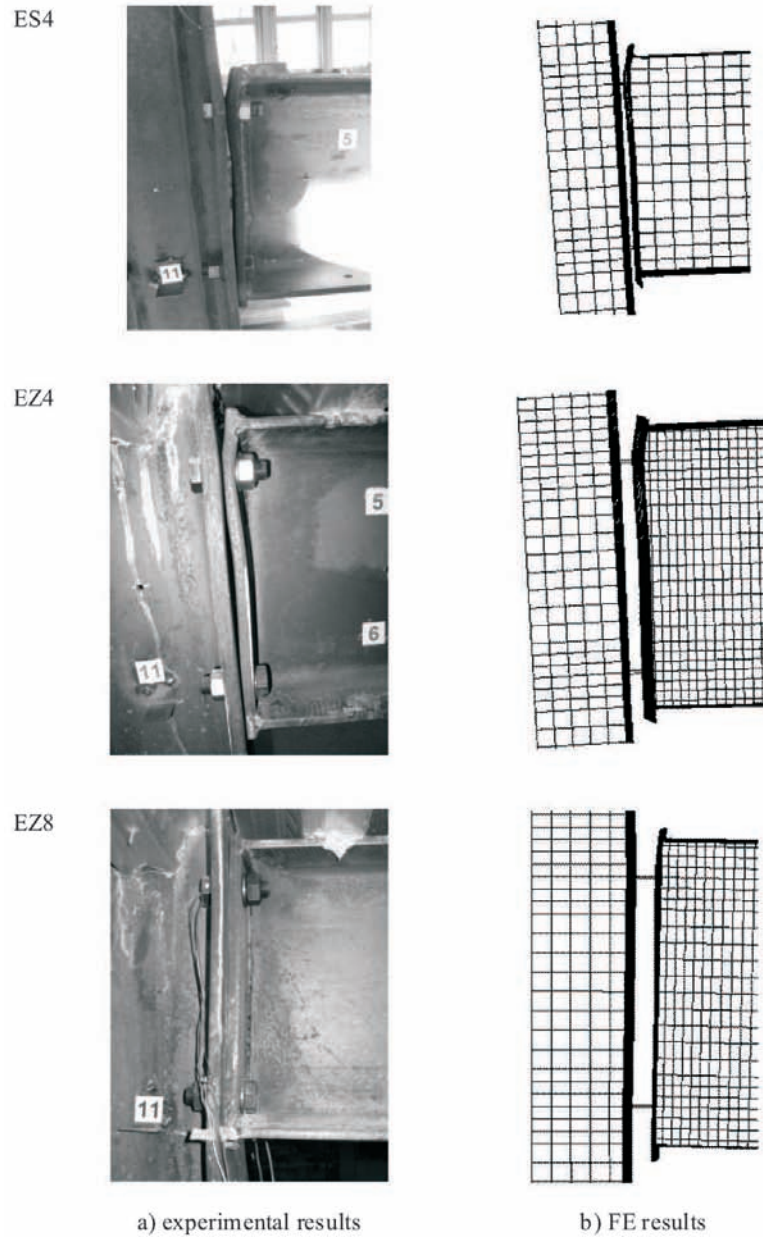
Deformed shape of joints with 12 mm flush end-plates.
